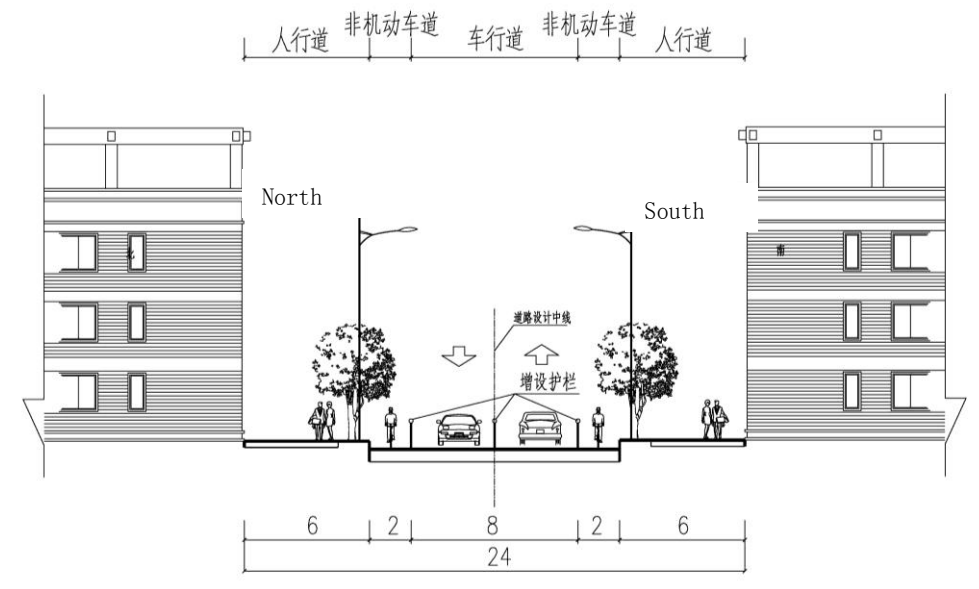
Sectional View for Reconstruction of Biyun Road (Binhe Avenue ~ Handan Road)
